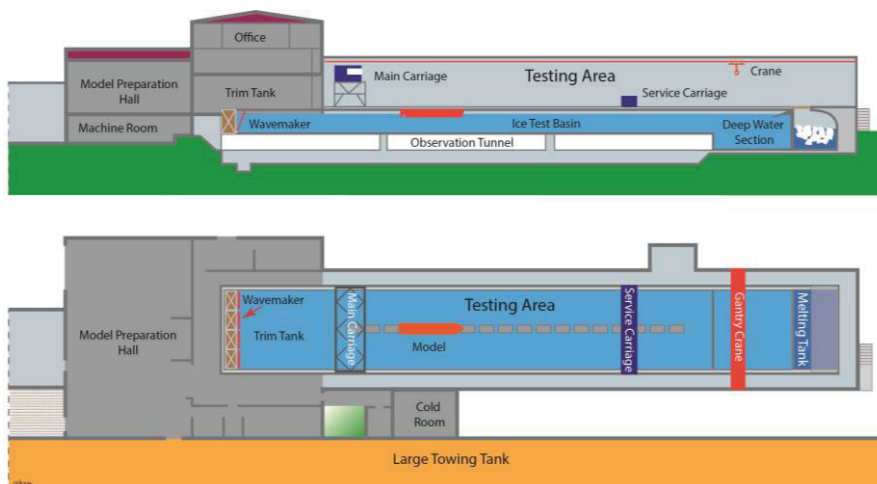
Cross section (top) and plan view (bottom) of the facilities at the main basin at HSVA. (Image: www.hsva.de)
